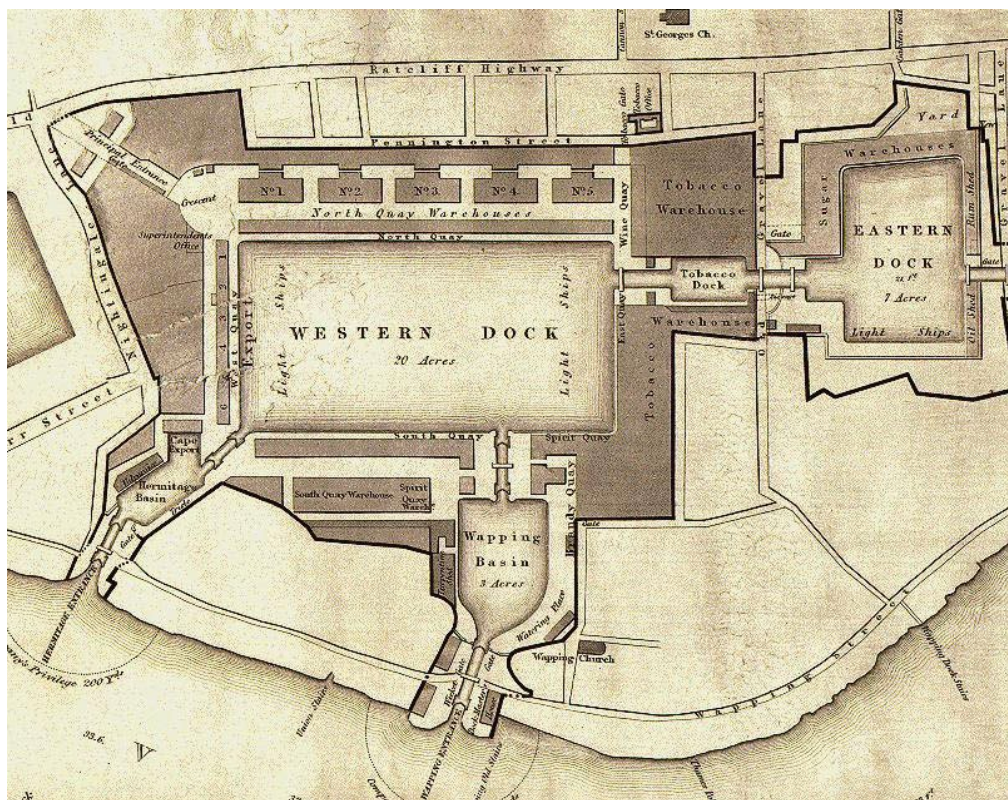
Plan of London Docks. *Henri Palmer, 1831.
